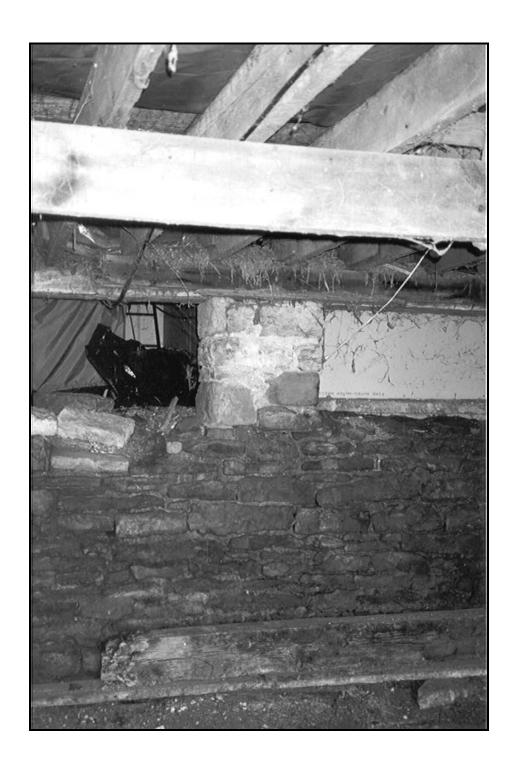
View of the interior foundations along the south side of the basement. The pier on top of the foundation wall helps support the north framing bent in the barn (FRR June 2001).
